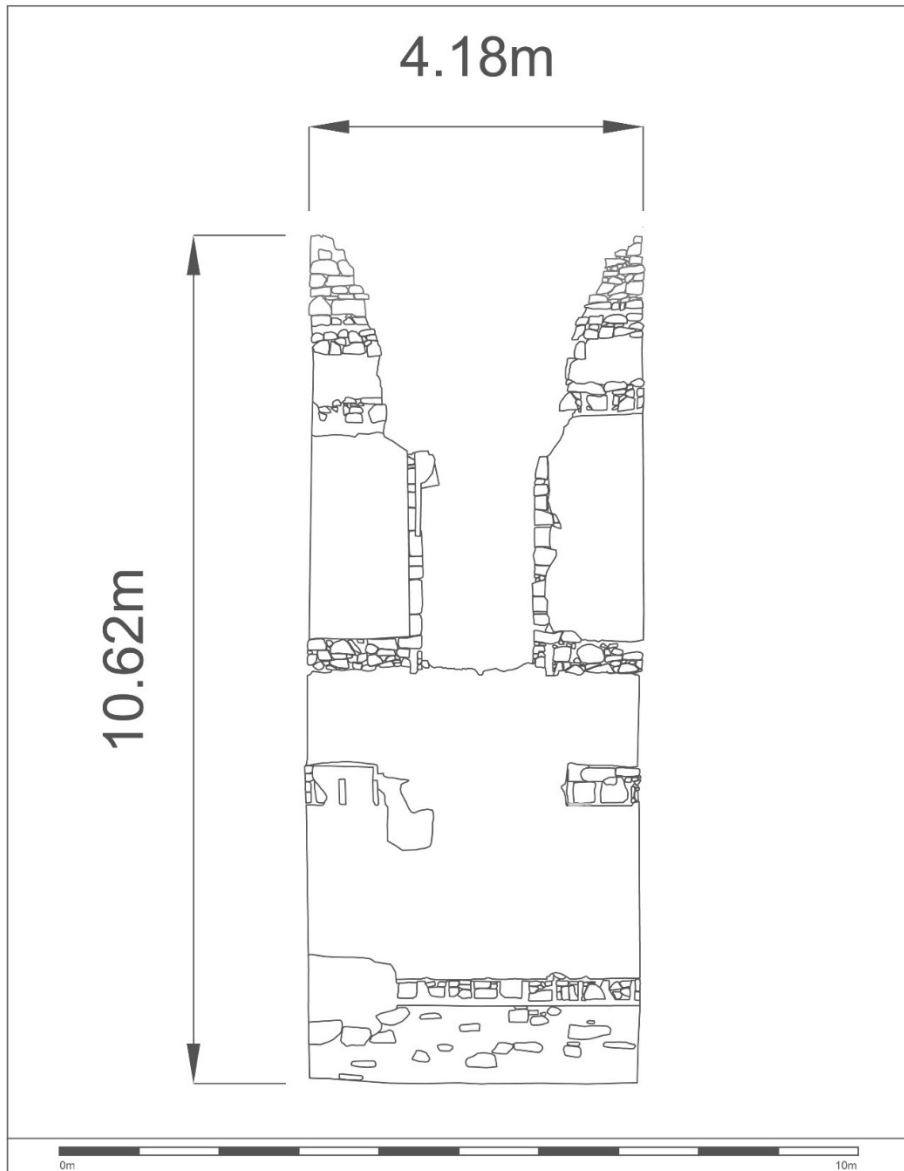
Internal elevation of the north-west wall of the signal tower at Mullaghderg Hill Signal Station.
